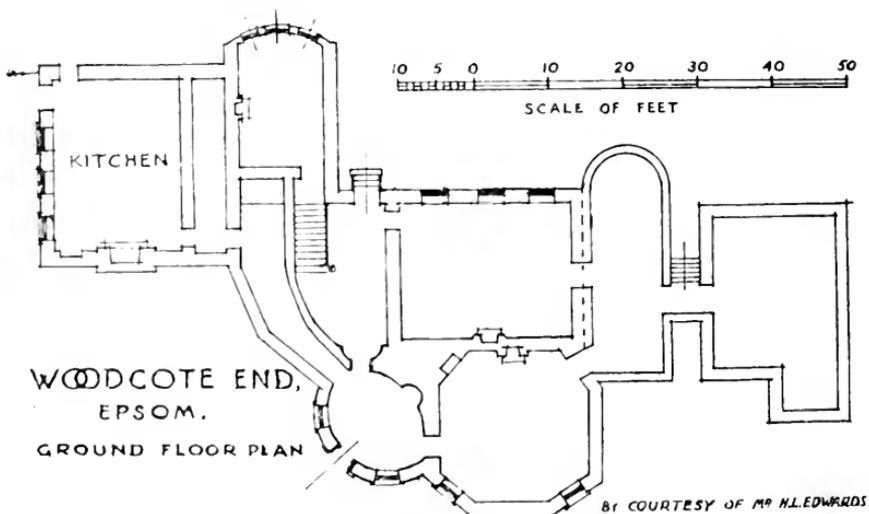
WOODCOTE END, EPSOM: GROUND FLOOR PLAN.
